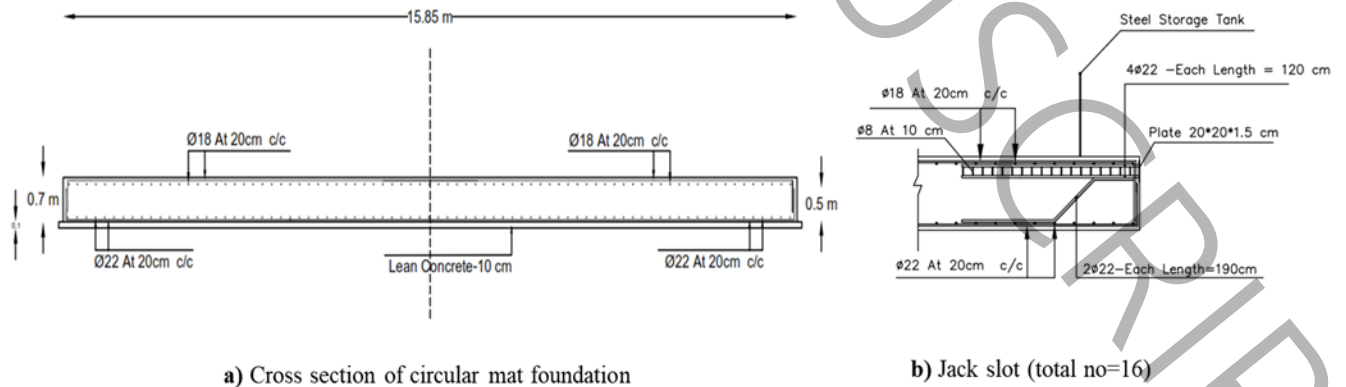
Circular mat foundation of tanks; a) Transverse section of the circular foundation, b) details for 16 jack slots
